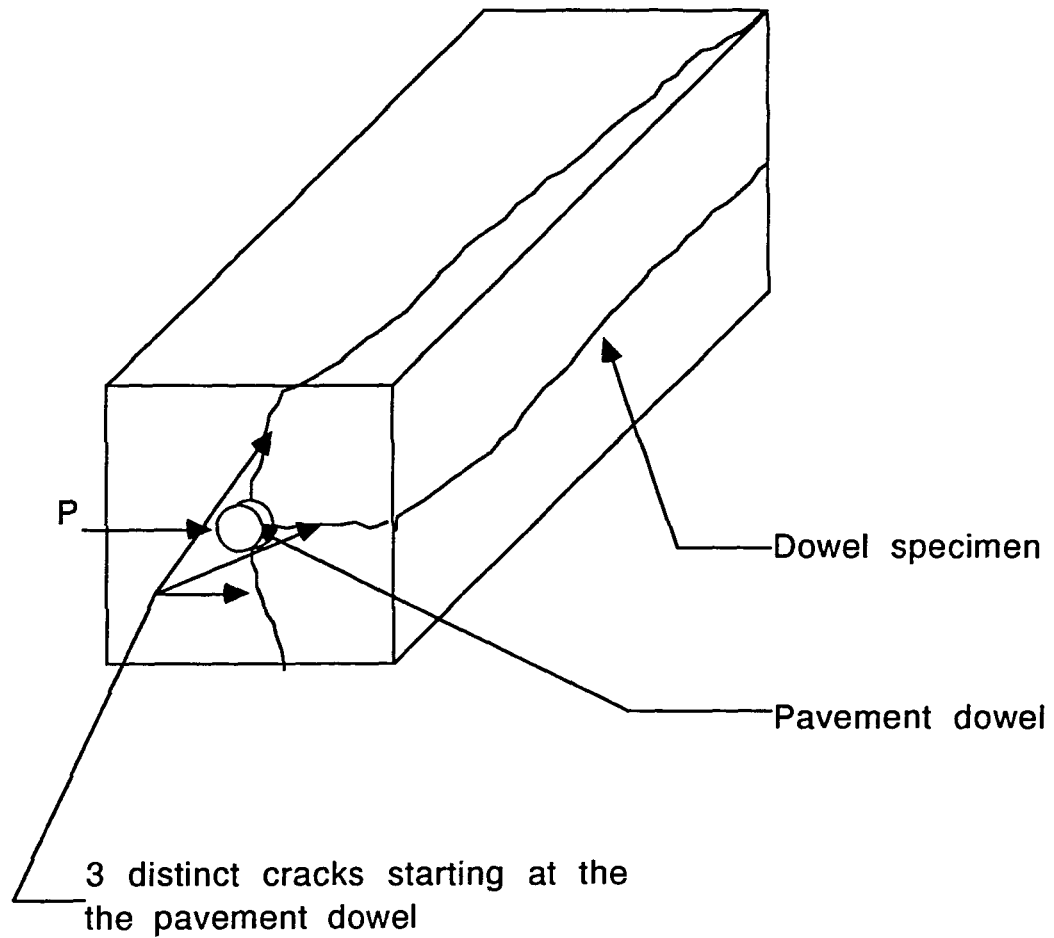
Sketch of the cracks which formed in the dowel specimens during testing
